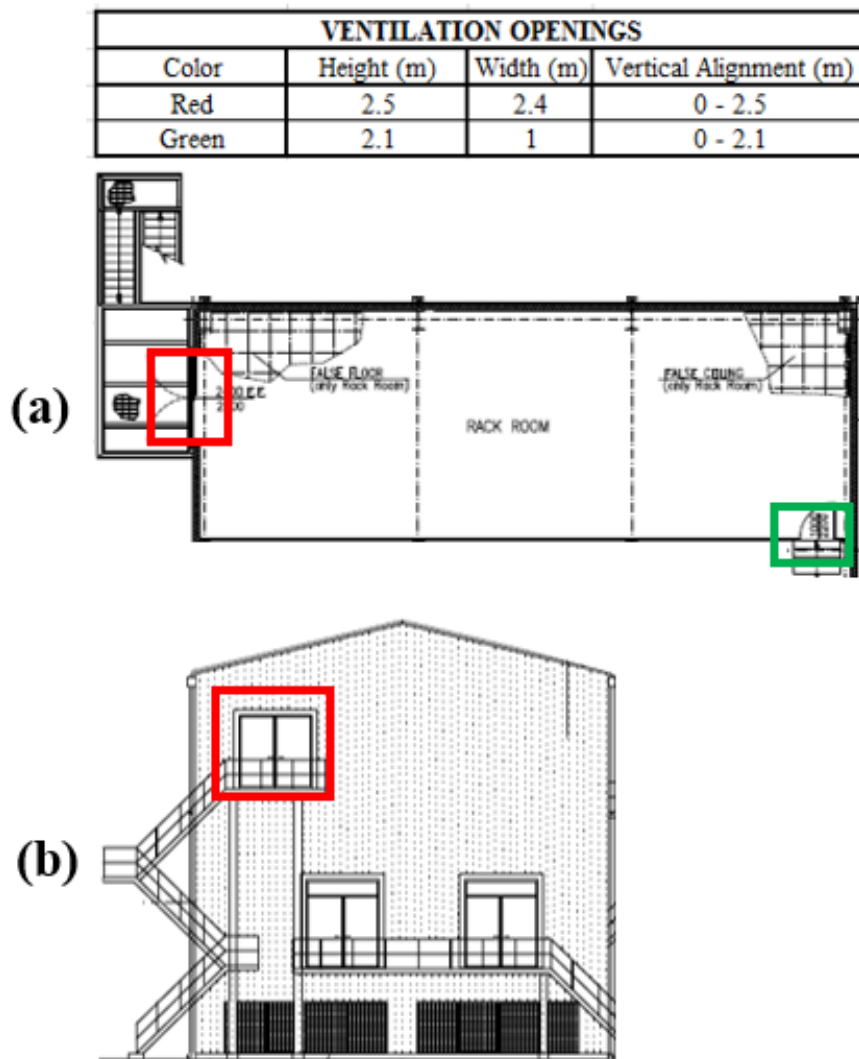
Architectural Drawings of the Building with the Highlighted Ventilation Openings (a) Fire Compartment Plan View (b) D Axis View.
